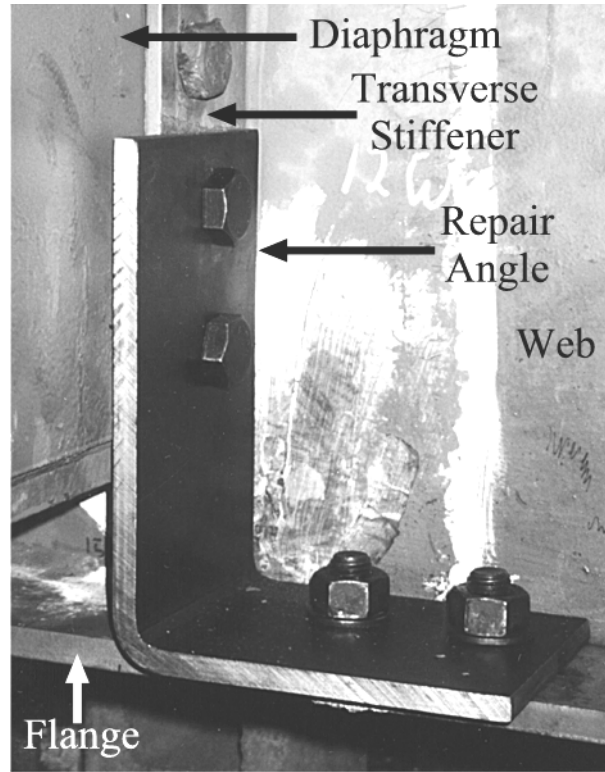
Repair Angle at Joint 12, Specimen 3
